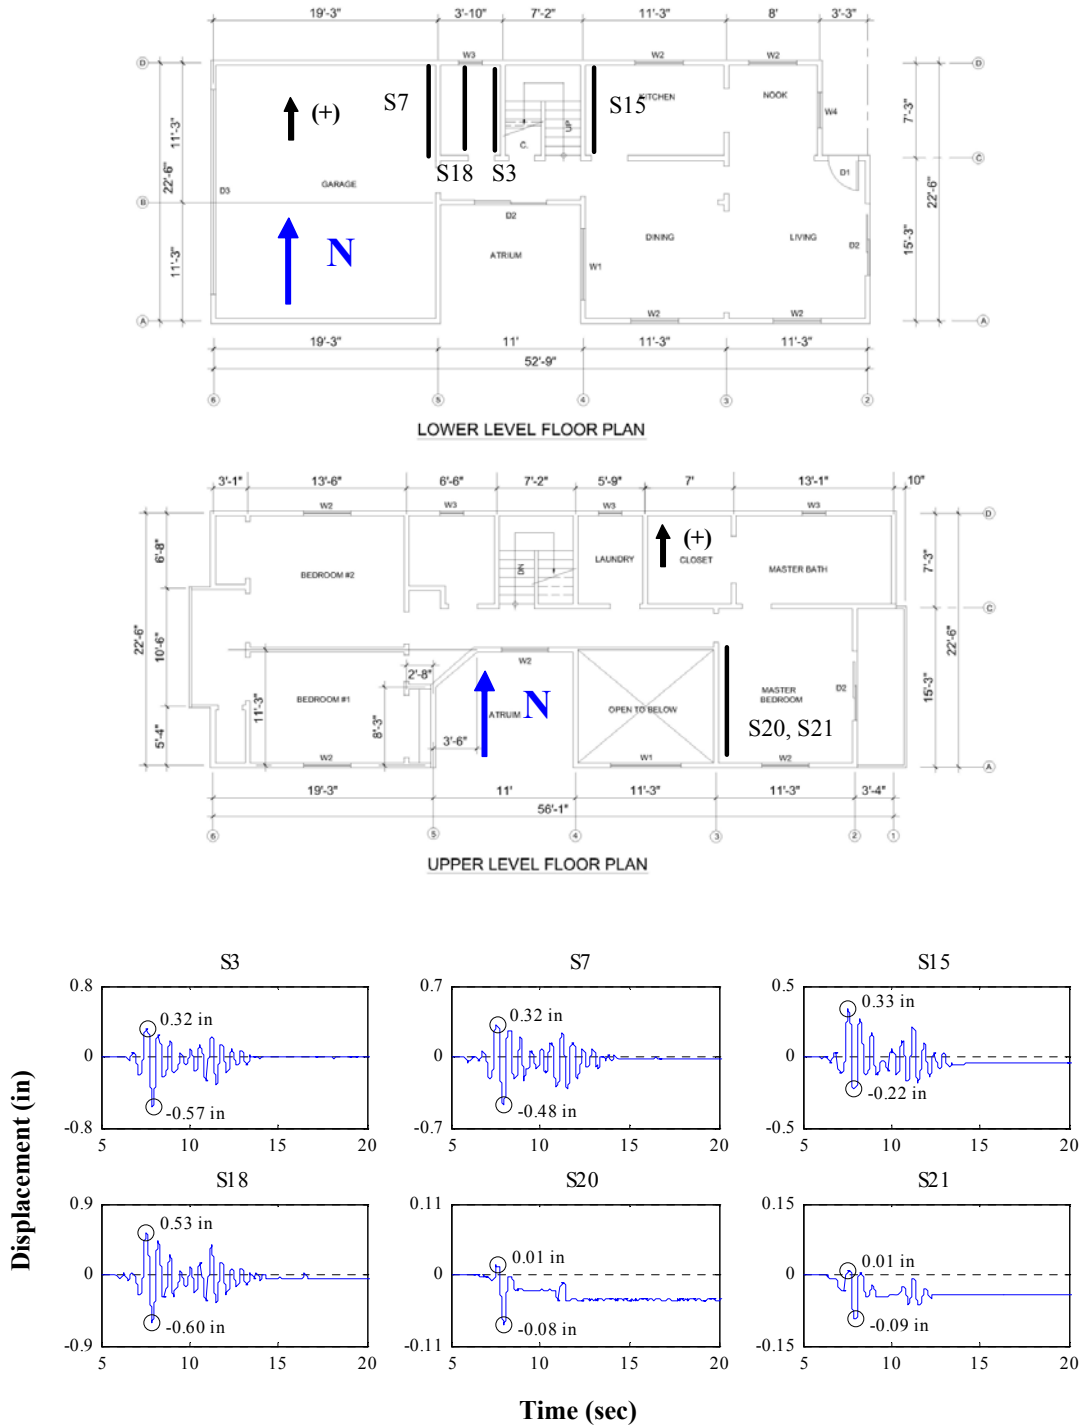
Wall deformations of internal walls for Test NWP5S09
